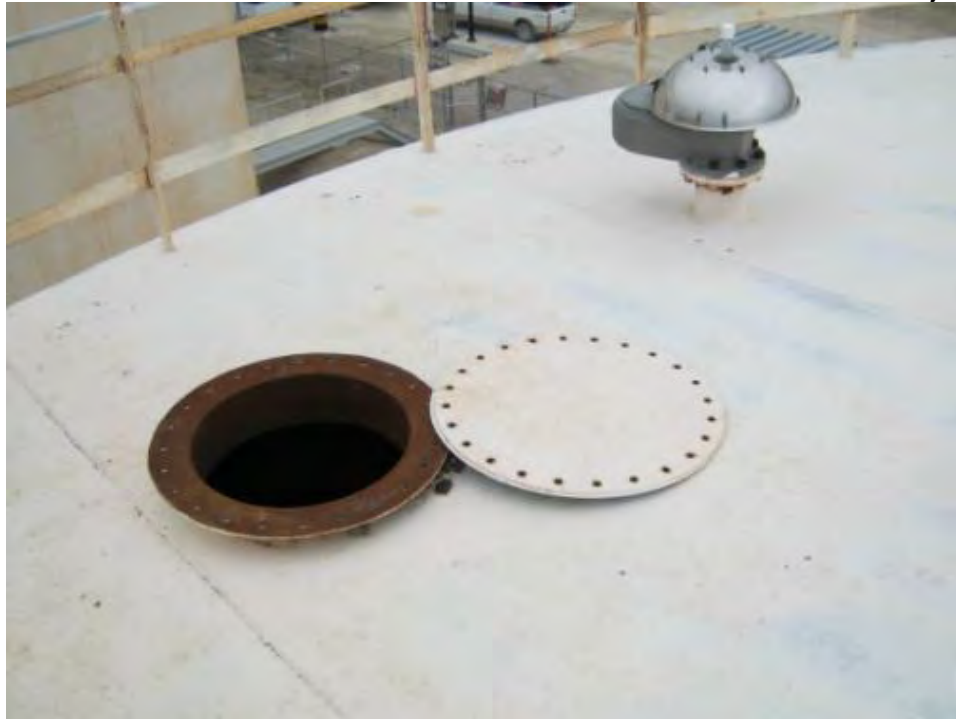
Roof PV vent and manway, note roof plate protective coating worn.
